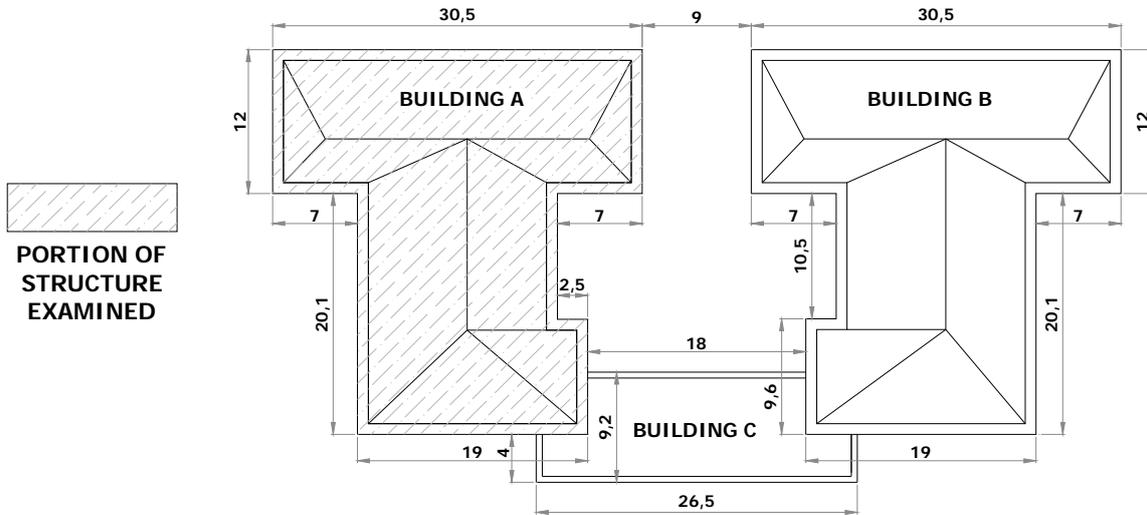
Plan layout of the structure of the school building retrofitted with unbonded braces
